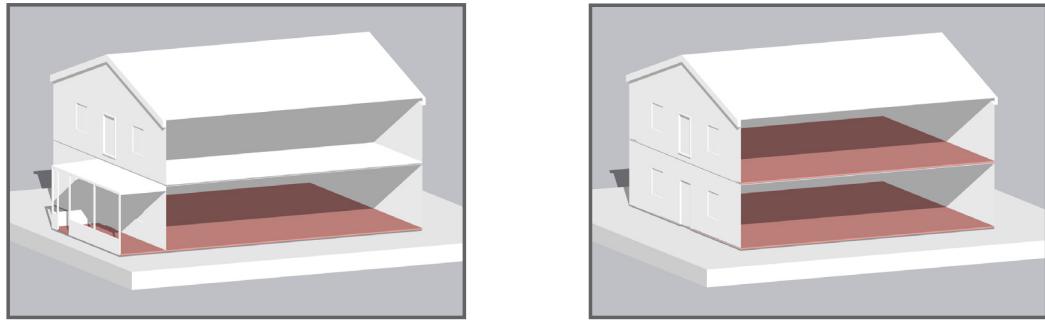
Graphic showing Building Footprint (left) as the area of the ground floor of the building and showing Gross Floor Area (right) as the total square footage of all stories of the building.
